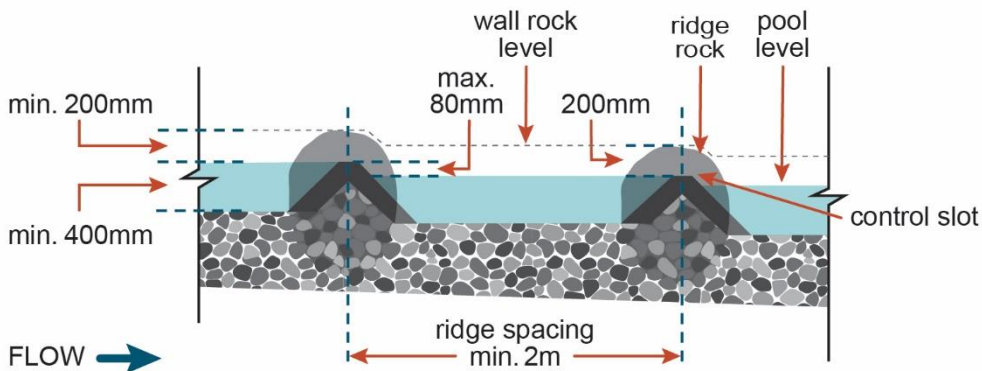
Interim rock ramp fishway showing pool and rock detail (long-section of waterway) – amber and green waterways
